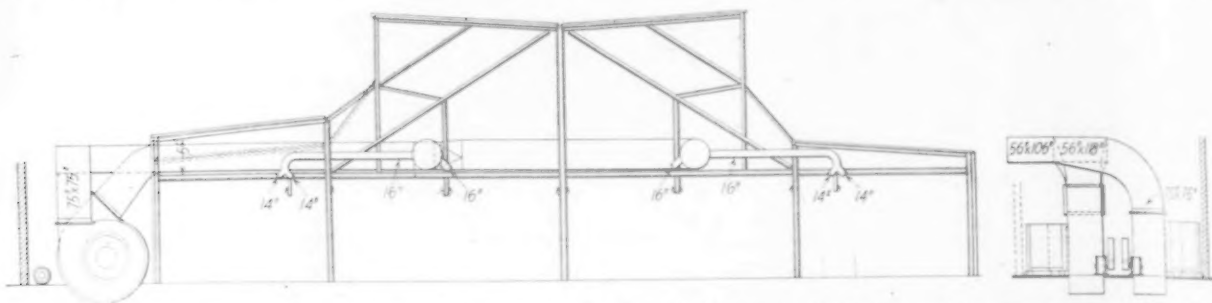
A Sectional Elevation of the Foundry Showing the Arrangement of the Structural Members and Ventilating Ducts. The Concrete Roof Sloping Toward the Center Is a Noteworthy Feature
